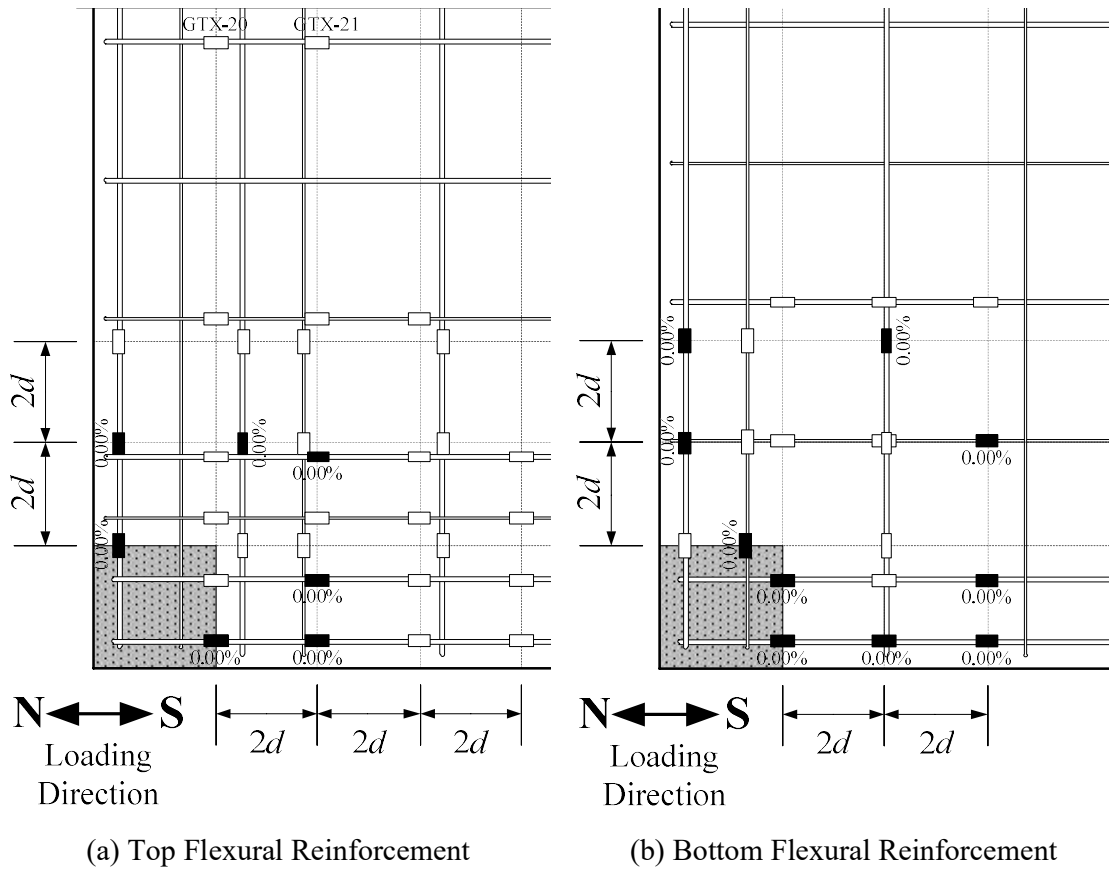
Extent of Yielding of the Slab Flexural Reinforcement of Specimen G2
